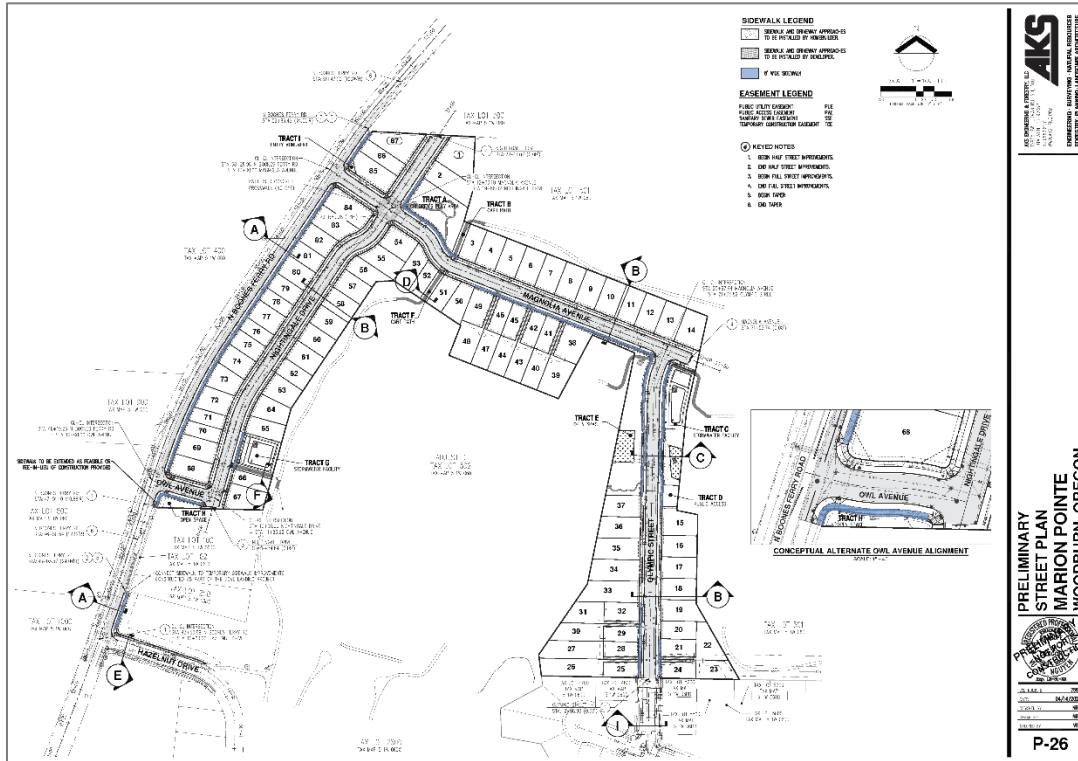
Site Plan Sheet P-26 Sidewalks (blue: min 8 ft wide); see Attachment 103 for full size
